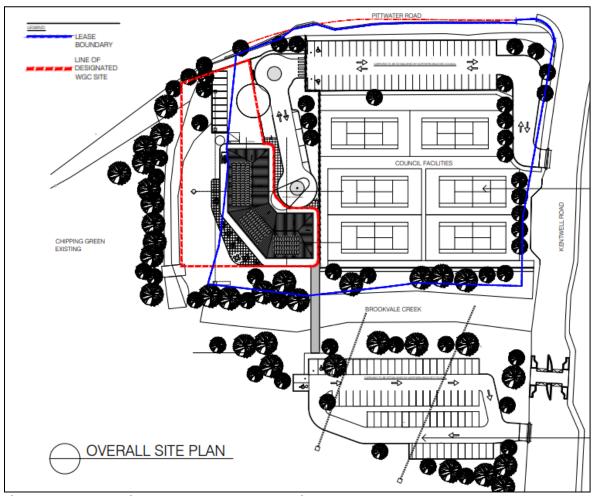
Proposed Site Plan (Source: Group Architects, 2022)
